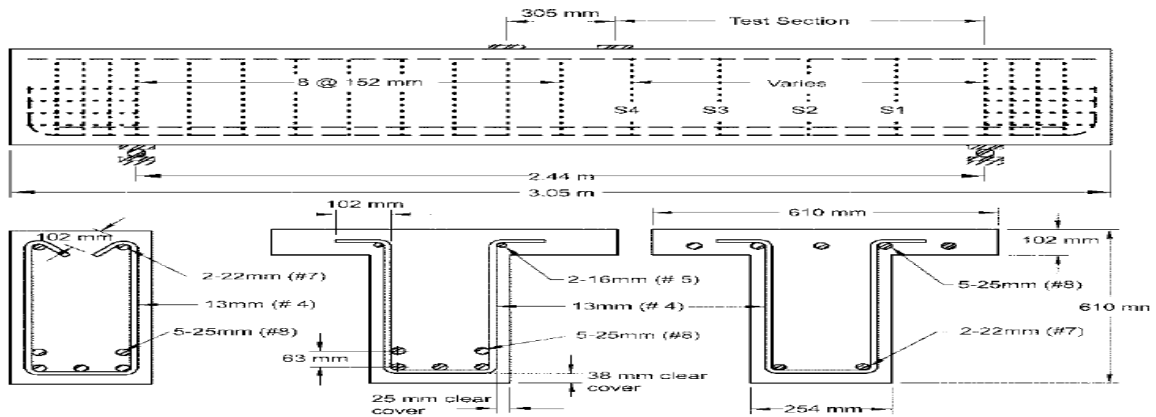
Beams and span configurations (Higgins and Farrow, 2006)
